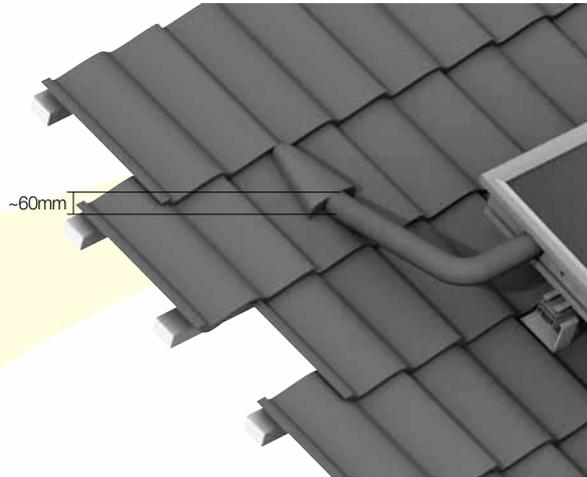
Detail View of Solar Collector Field Connection - On-Roof Systems
